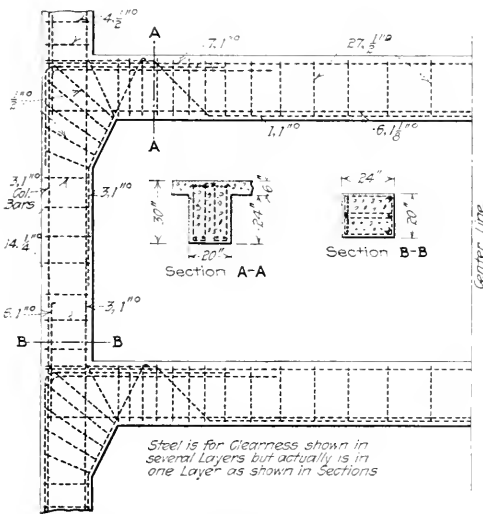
REINFORCING DETAILS AT RIGID CONNECTION OF BEAM TO COLUMN
